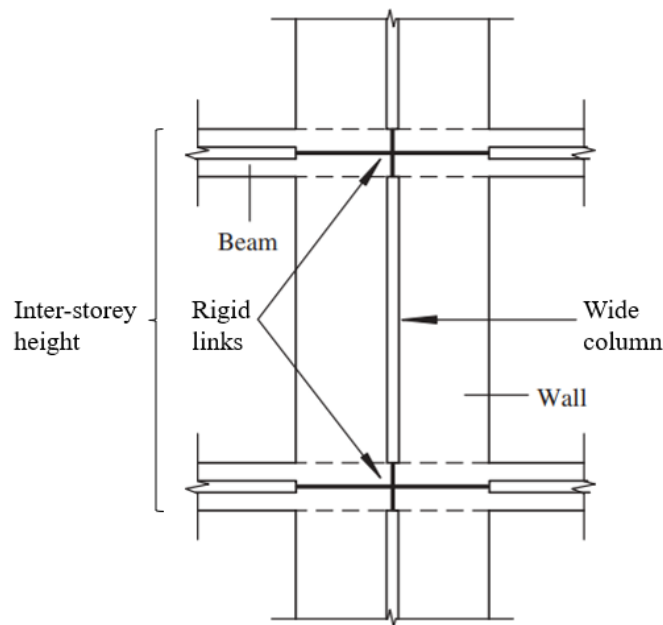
Wide column and rigid links for modelling a RC wall in frame-wall system
